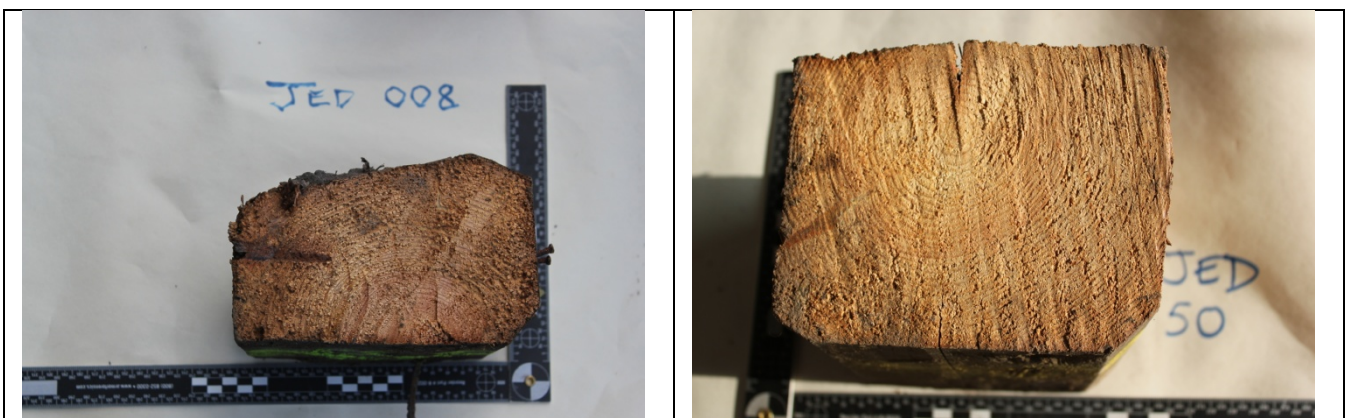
Group D Pine timbers (L) F008 from the first floor ceiling, a short re-used element
